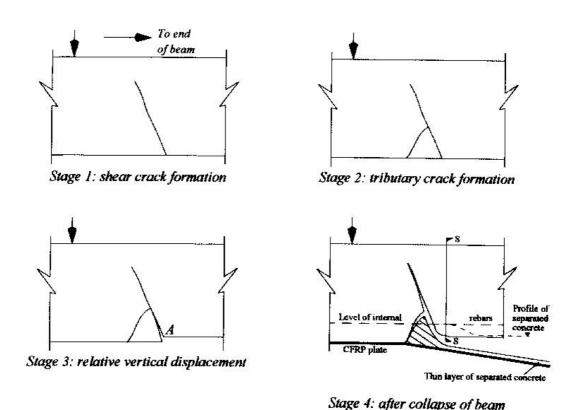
Progressive failure of CFRP plate externally bonded to concrete due to vertical and horizontal concrete crack openings near to loading point [29]
